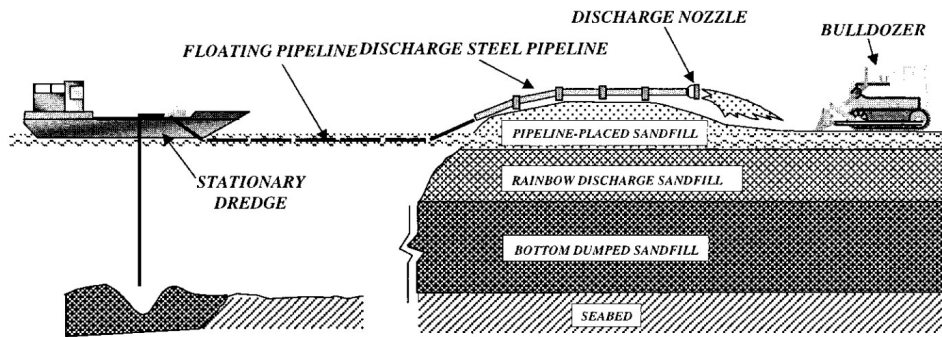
Transporting and placement of fill materials hydraulically through floating steel pipes (Lee et al., 1999)
